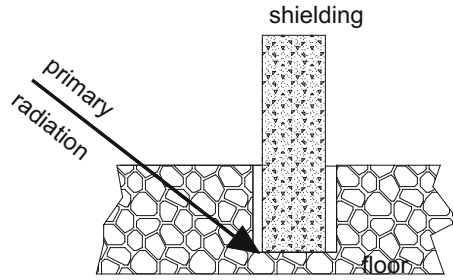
Design of a wall-ground interface avoiding the scattering on the floor
